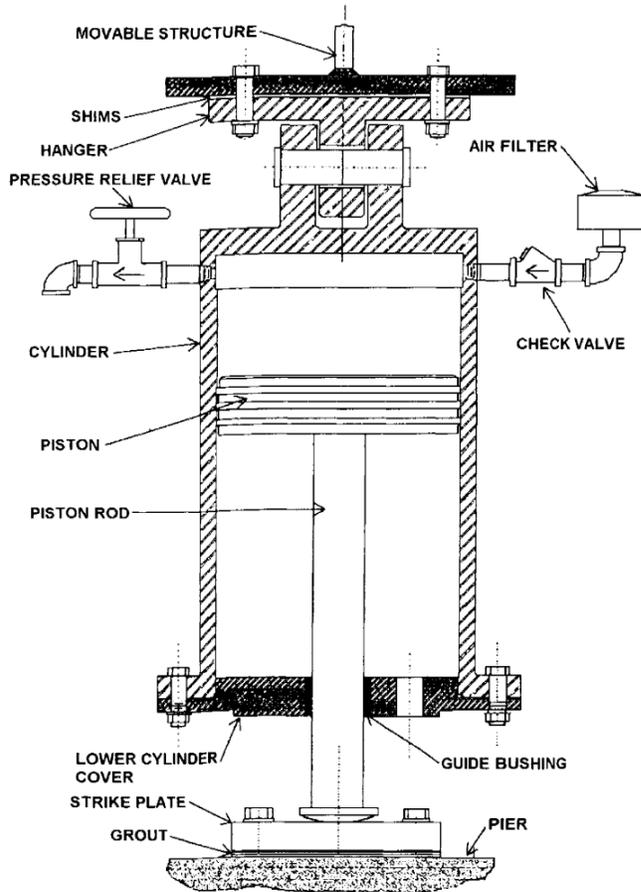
Construction of a typical buffer cylinder
